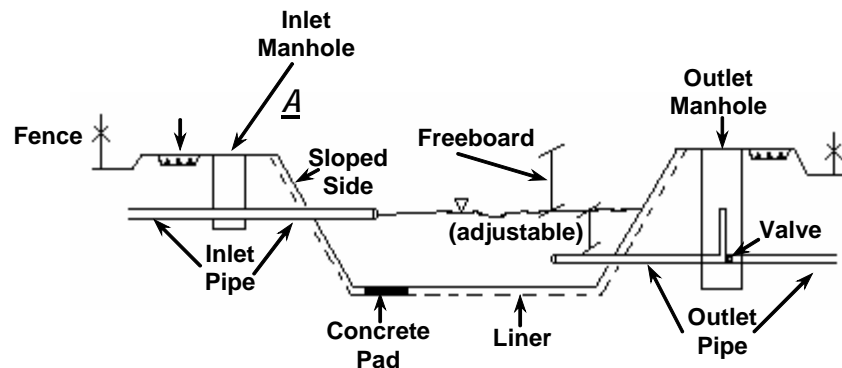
Typical lagoon design. [From Wastewater Stabilization Ponds, 1981]
